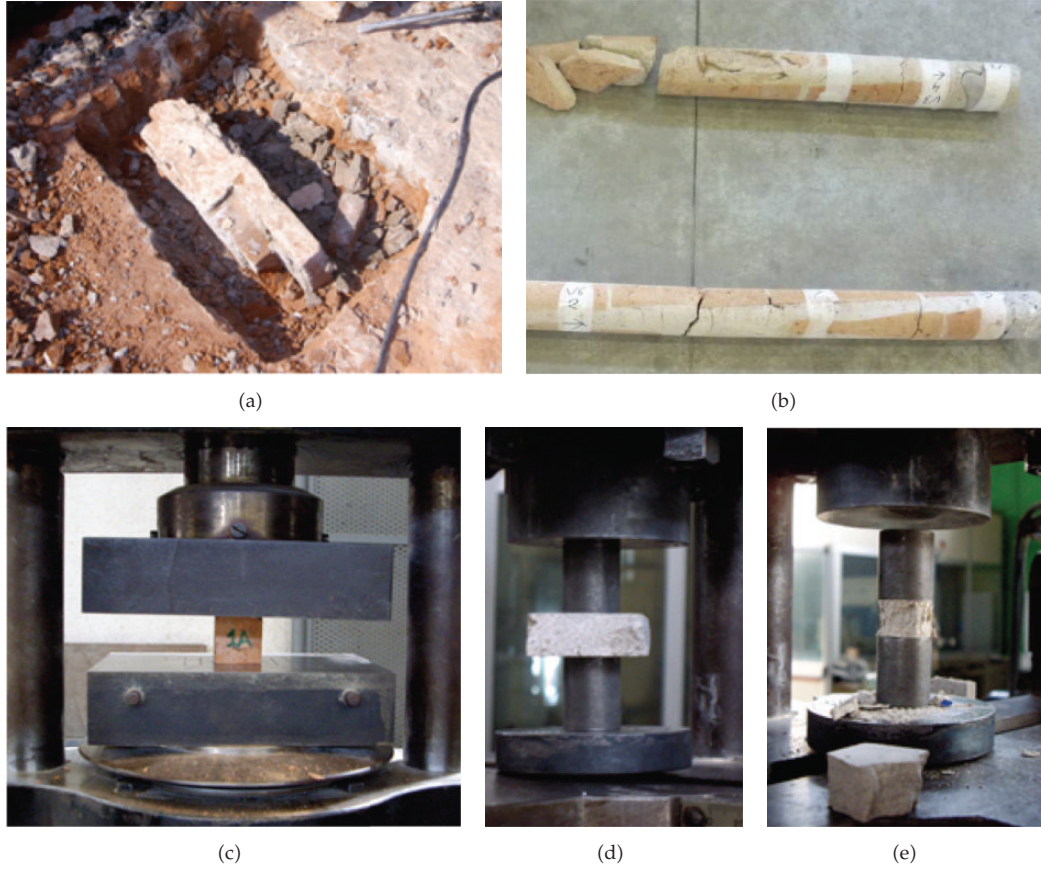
Sampling of a masonry portion from (a) the bridge arch barrel and from (b) the pillar; testing of (c) brick and (d)-(e) mortar specimens.
